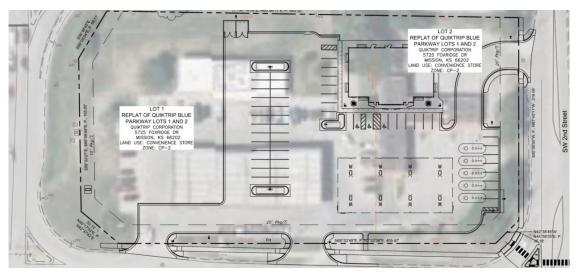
Proposed site plan overlaid on aerial of existing conditions (plan north to the right)
